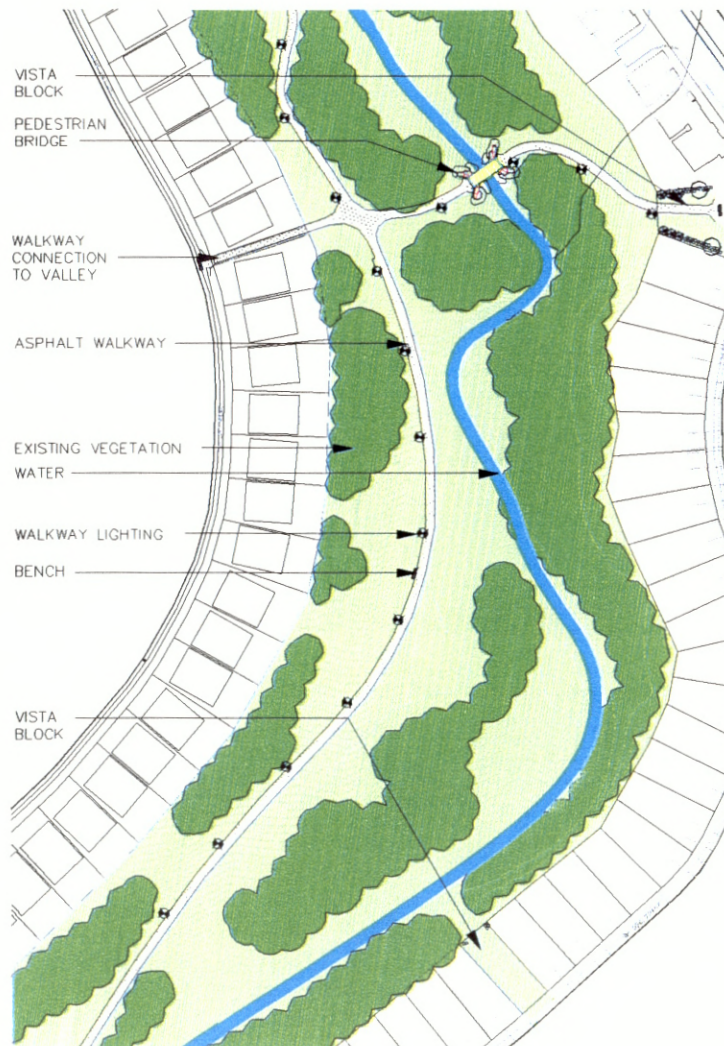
TYPICAL PLAN OF VALLEY N.T.S.
